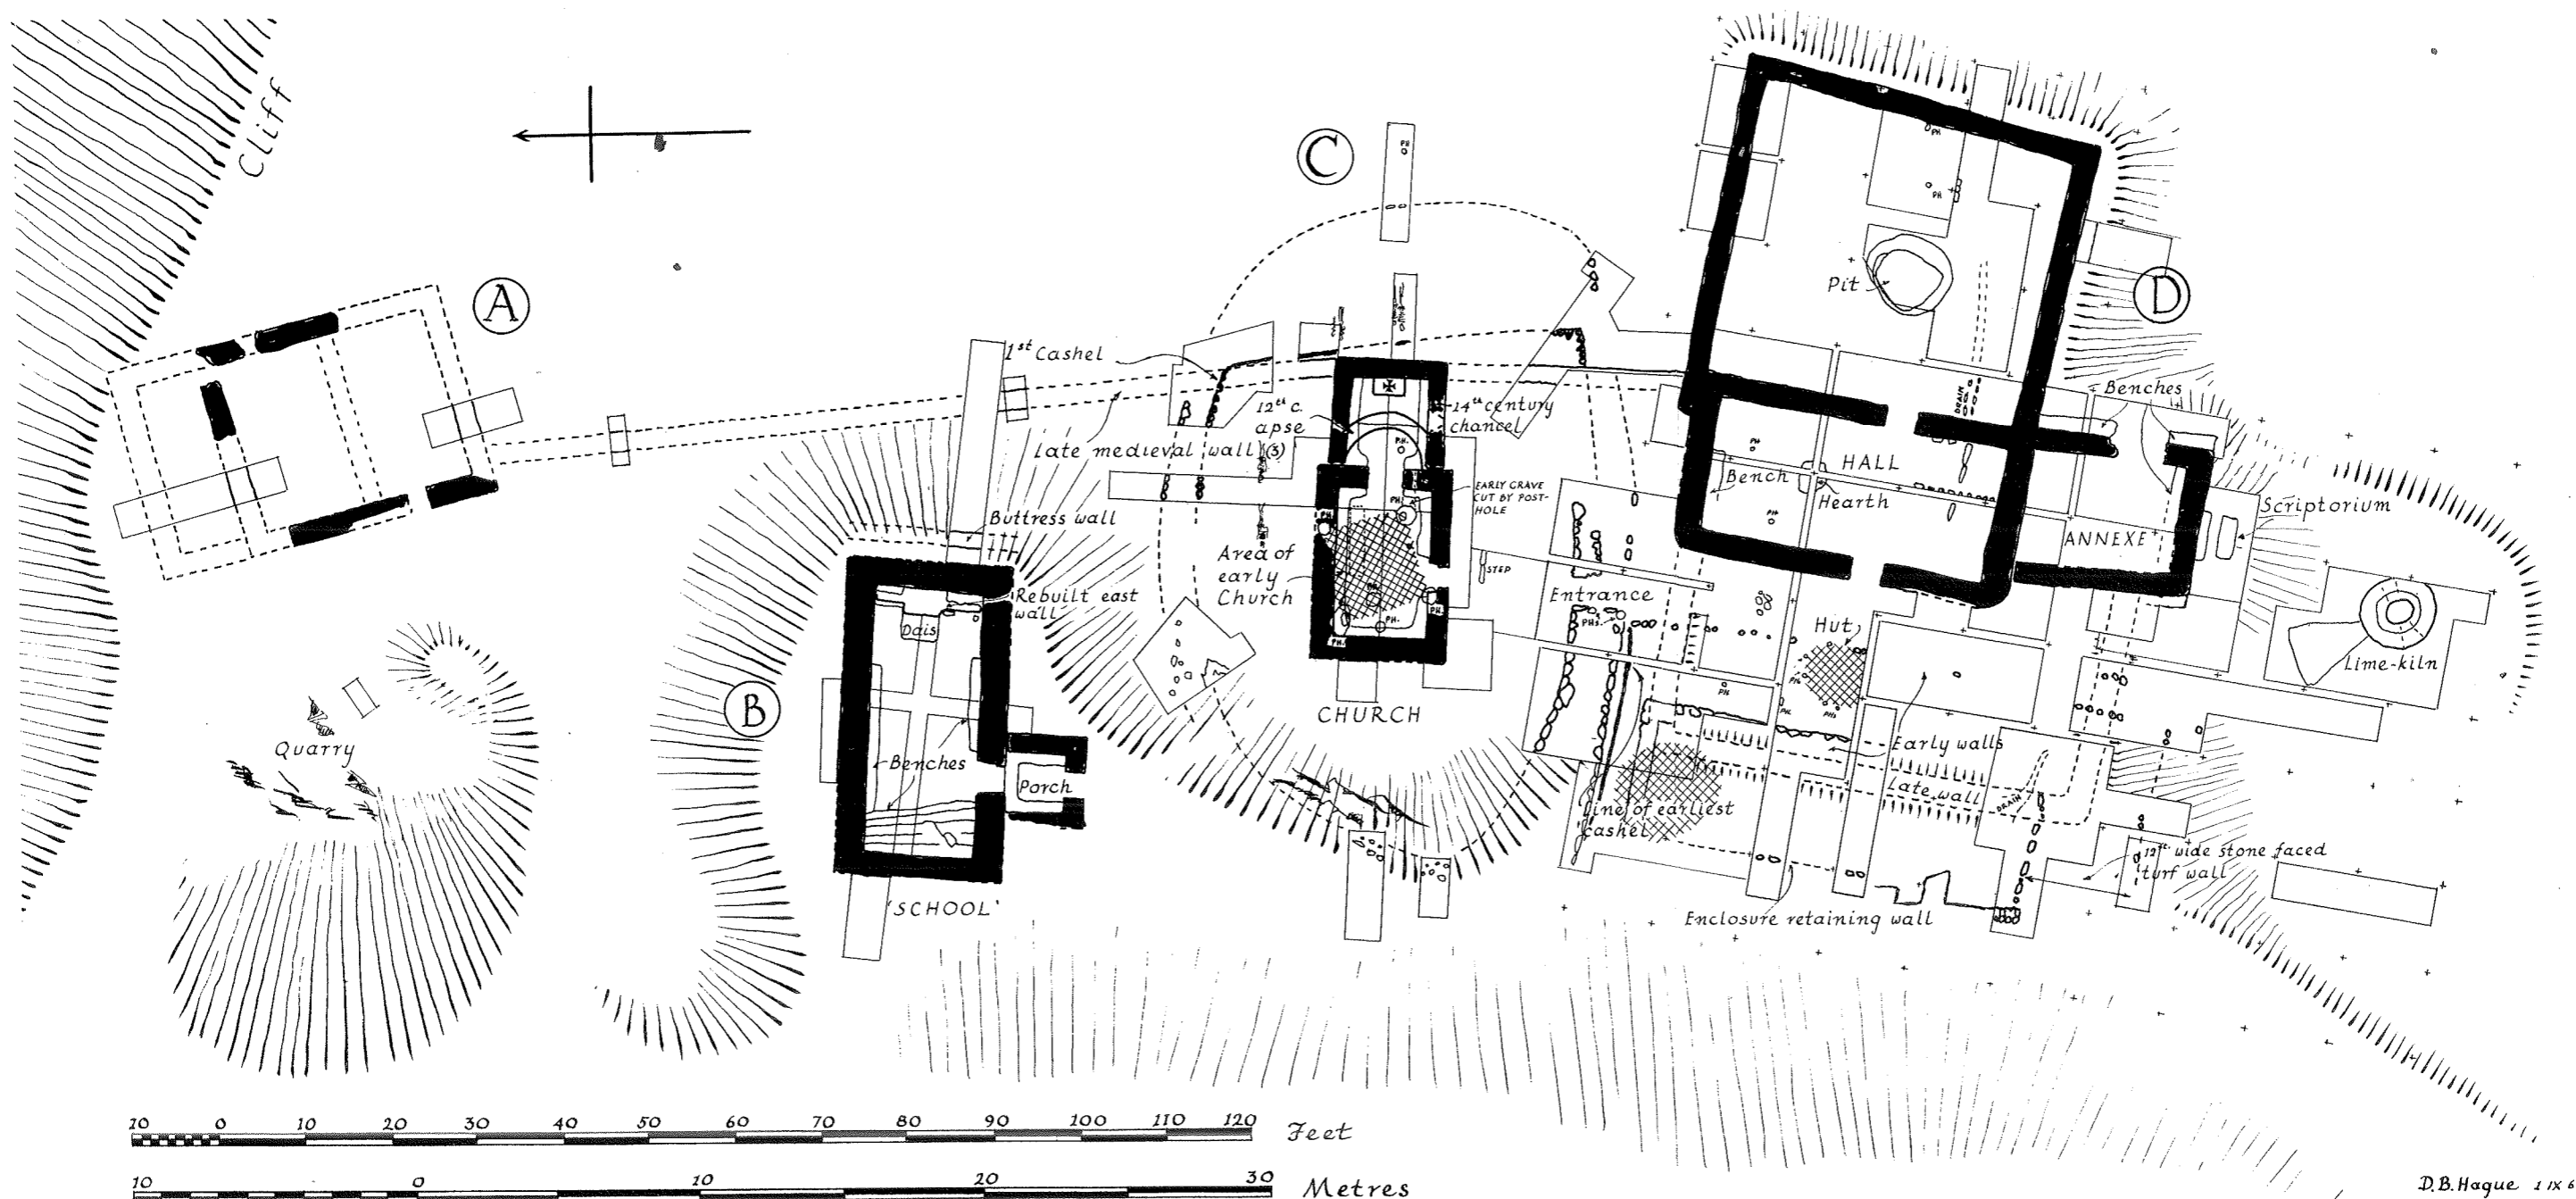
St Tudwal's East Island; Plan of Church and Adjacent Buildings.
